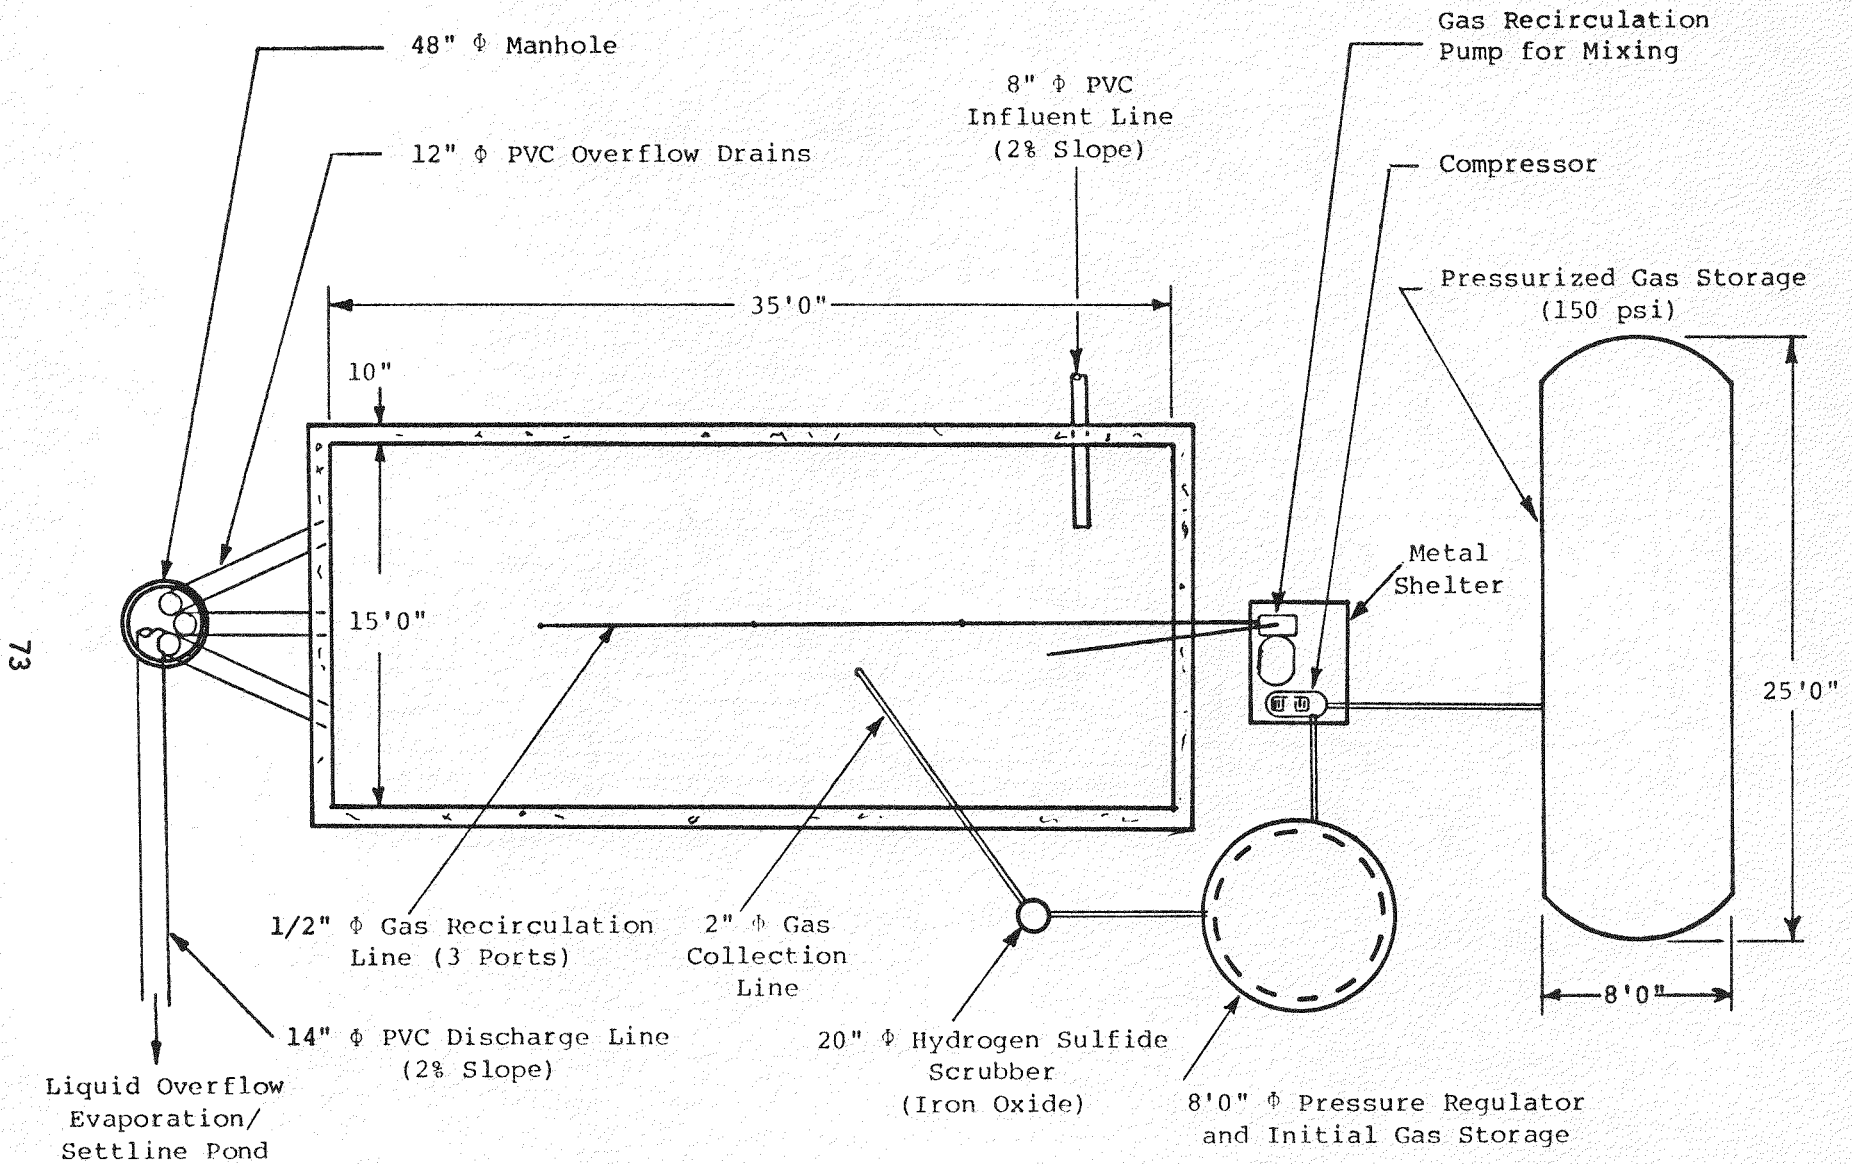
Plan View of Proposed Anaerobic Digestion Facilities
